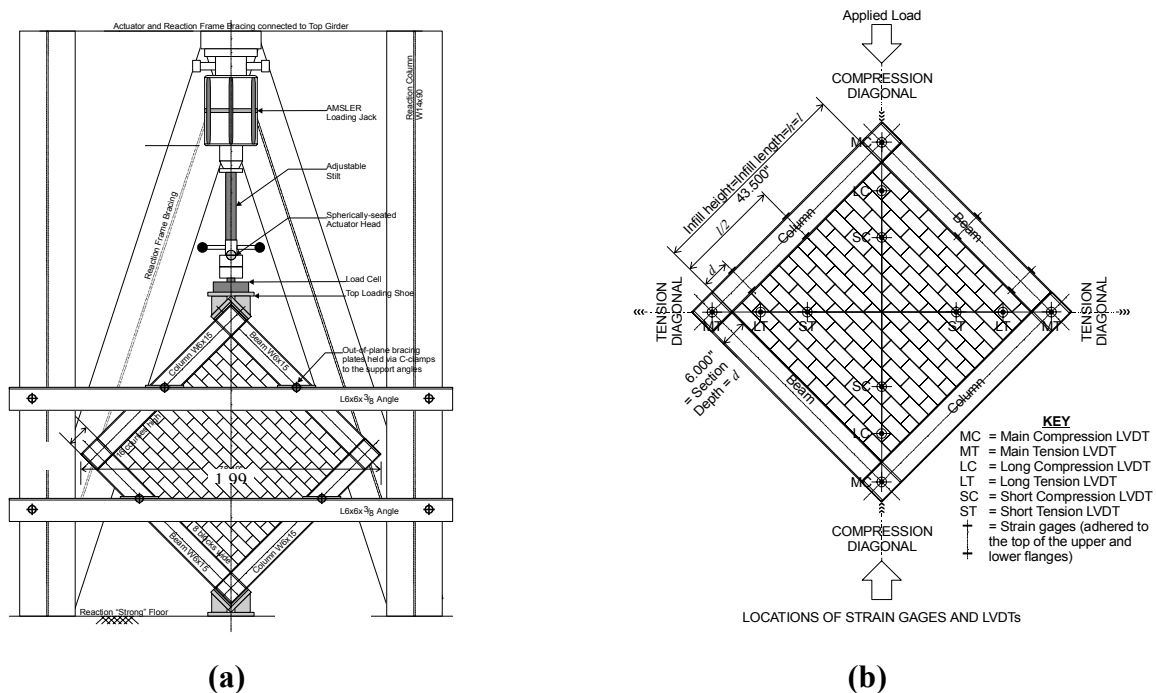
The masonry infilled steel frame specimens: a) test setup; b) instrumentation
